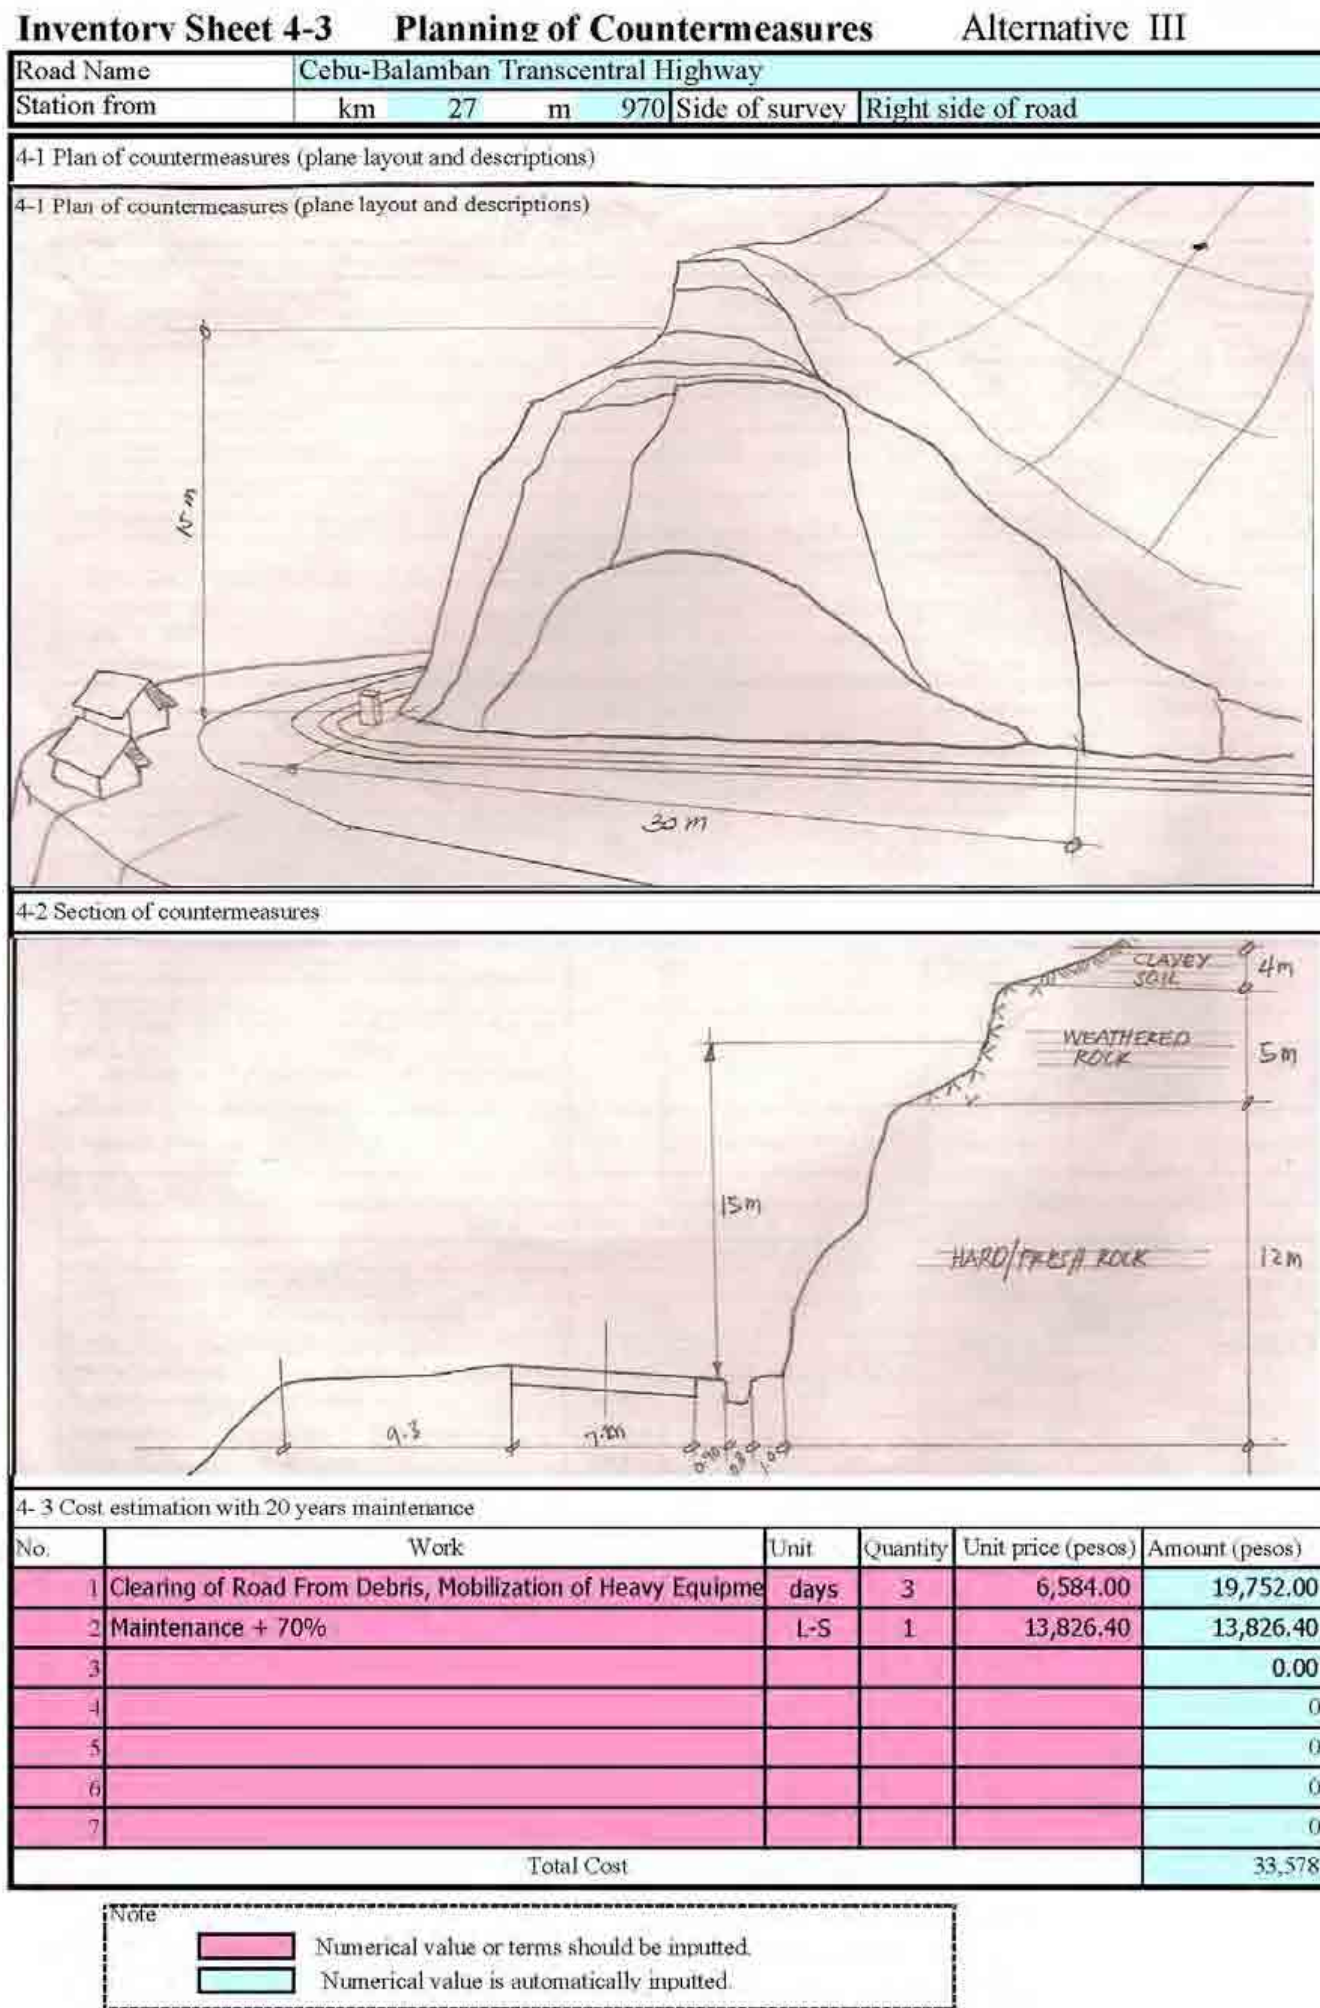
Example of Inventory Sheet 4-3: Planning of Countermeasure Alternative III for Rock Slope Collapse
